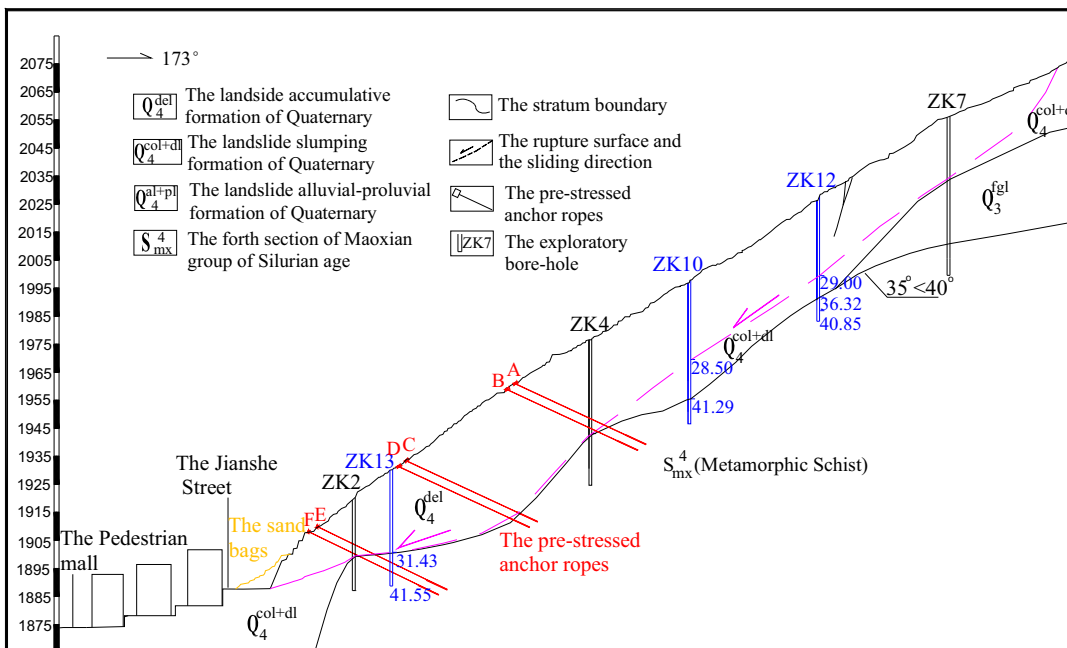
The sectional arrangement plan of the urgently wrecking engineering
